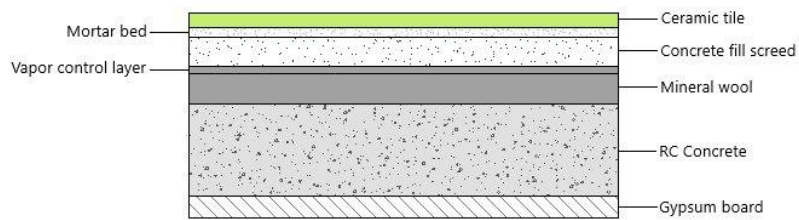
First floor and corridors floor finishing and ceiling cut view
